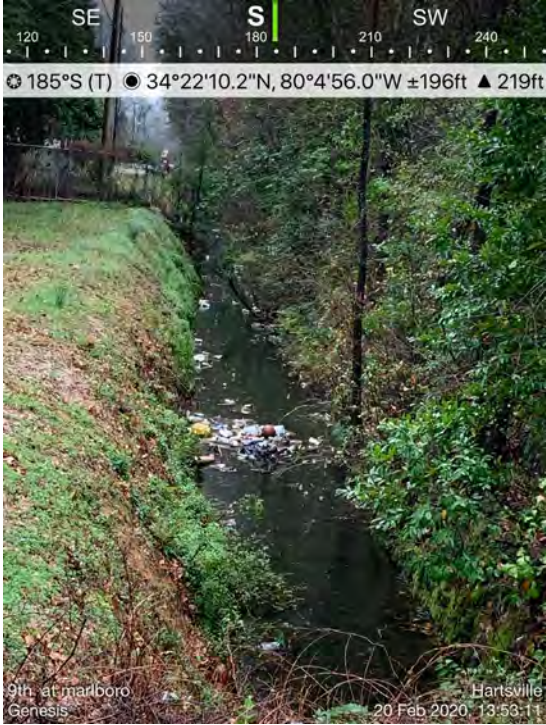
Ninth Street Ditch at Marlboro Ave – looking south. Note trash and debris.
